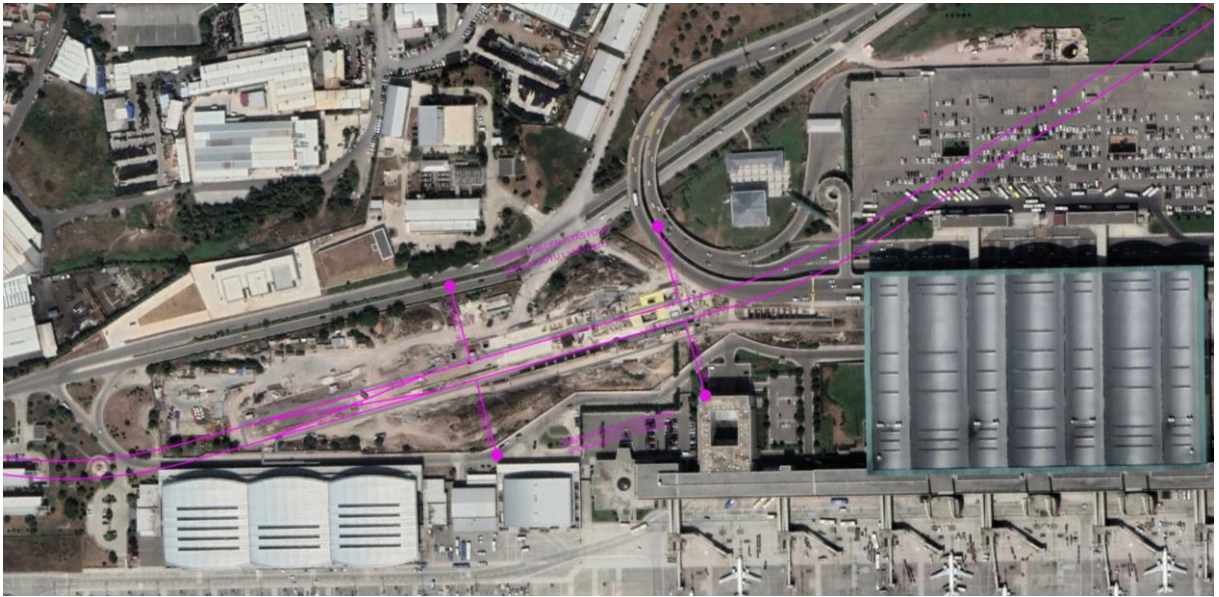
Structure of Sabiha Gökçen Airport Connection Station of Kadıköy-Pendik Line 2021 (AYGM, 2021)
